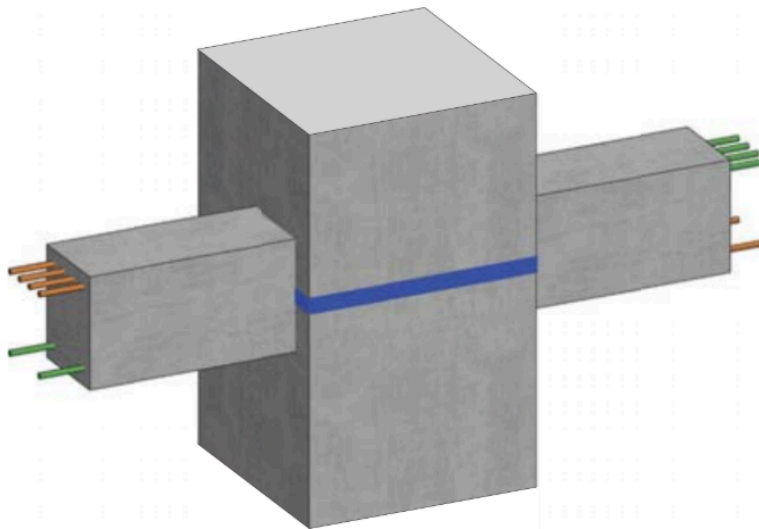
Joint design between the column and beam (ACI, 2019)
